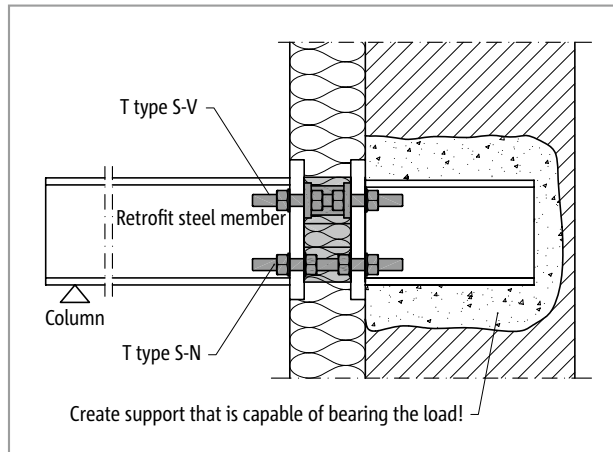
Schöck Isokorb® T type S-N and T type S-V for retrofitted supported steel structure; further examples of renovation see p. 90
